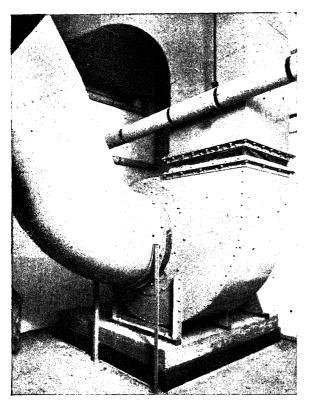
Blowing ductwork connected to centrifugal fan with flexible connections (Airducts, Ltd.)
